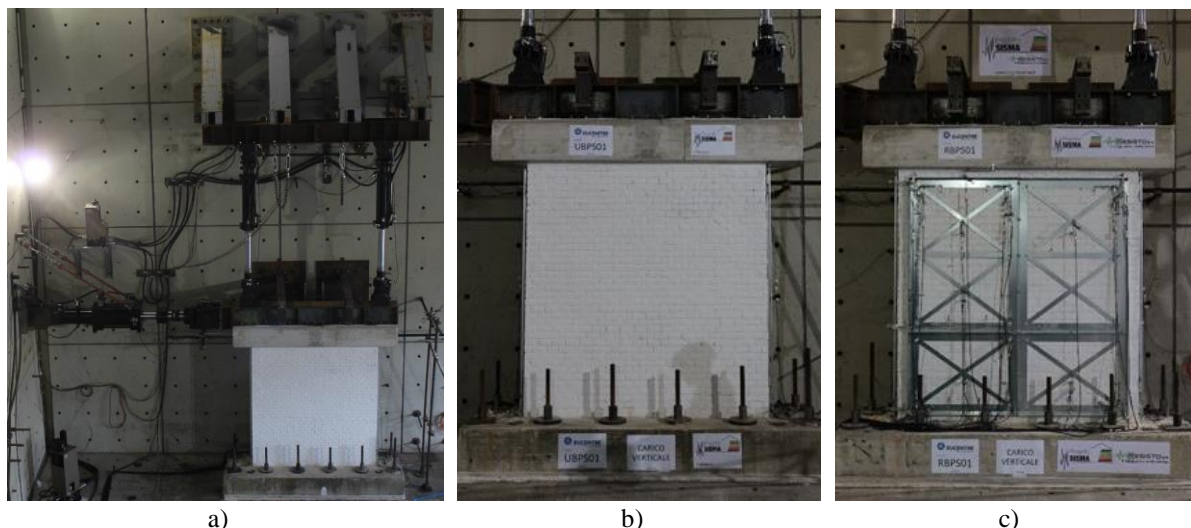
Experimental in-plane tests: a) set-up; b) unreinforced specimen UBPS01; c) retrofitted specimen RBPS01.
